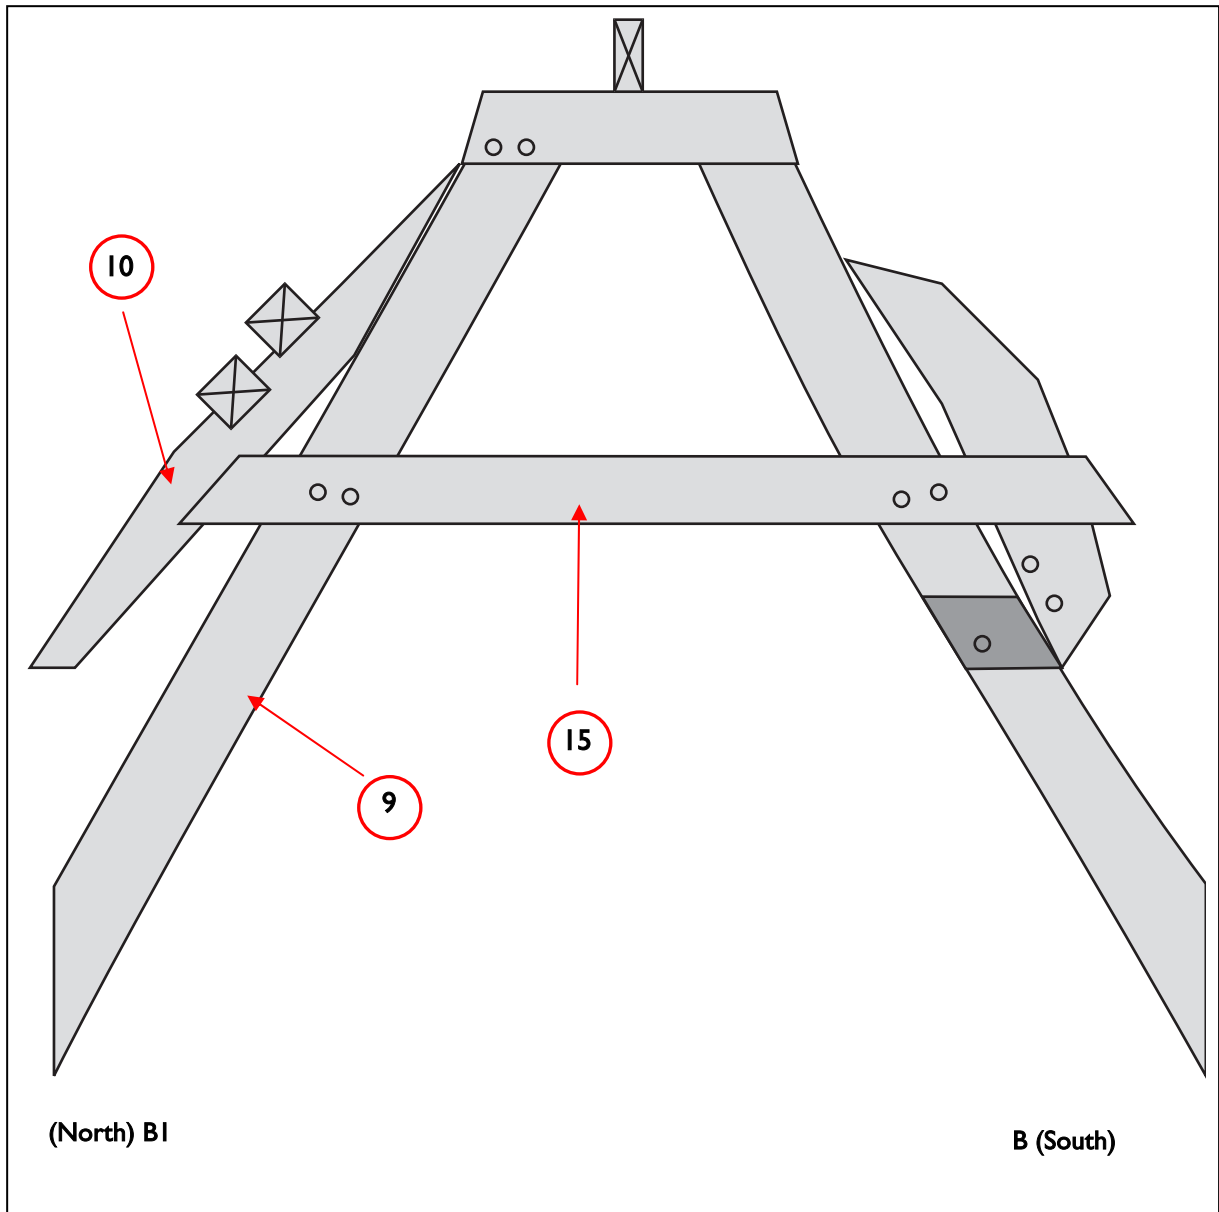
Barn 2 – schematic section of truss B-B1 to show sampled timbers. The shaded area indicates a redundant half-lap joint (viewed from the west looking east)
